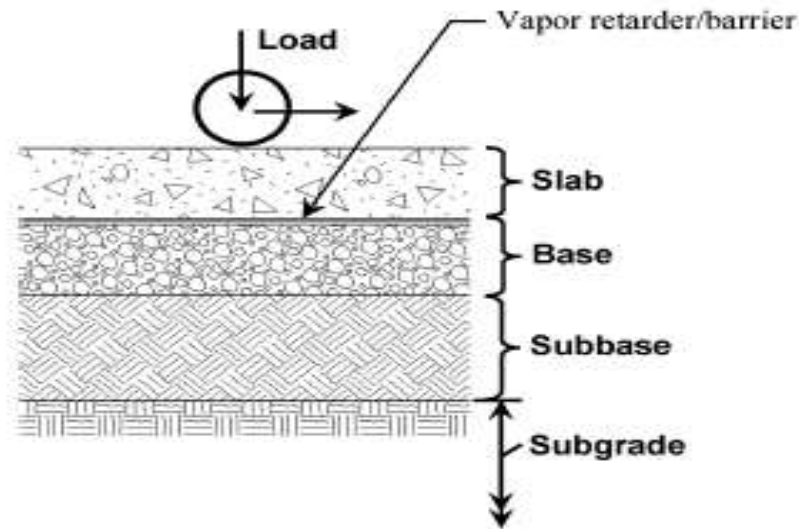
Slab-on-grade Support System (ACI 360R-10, 2010)
